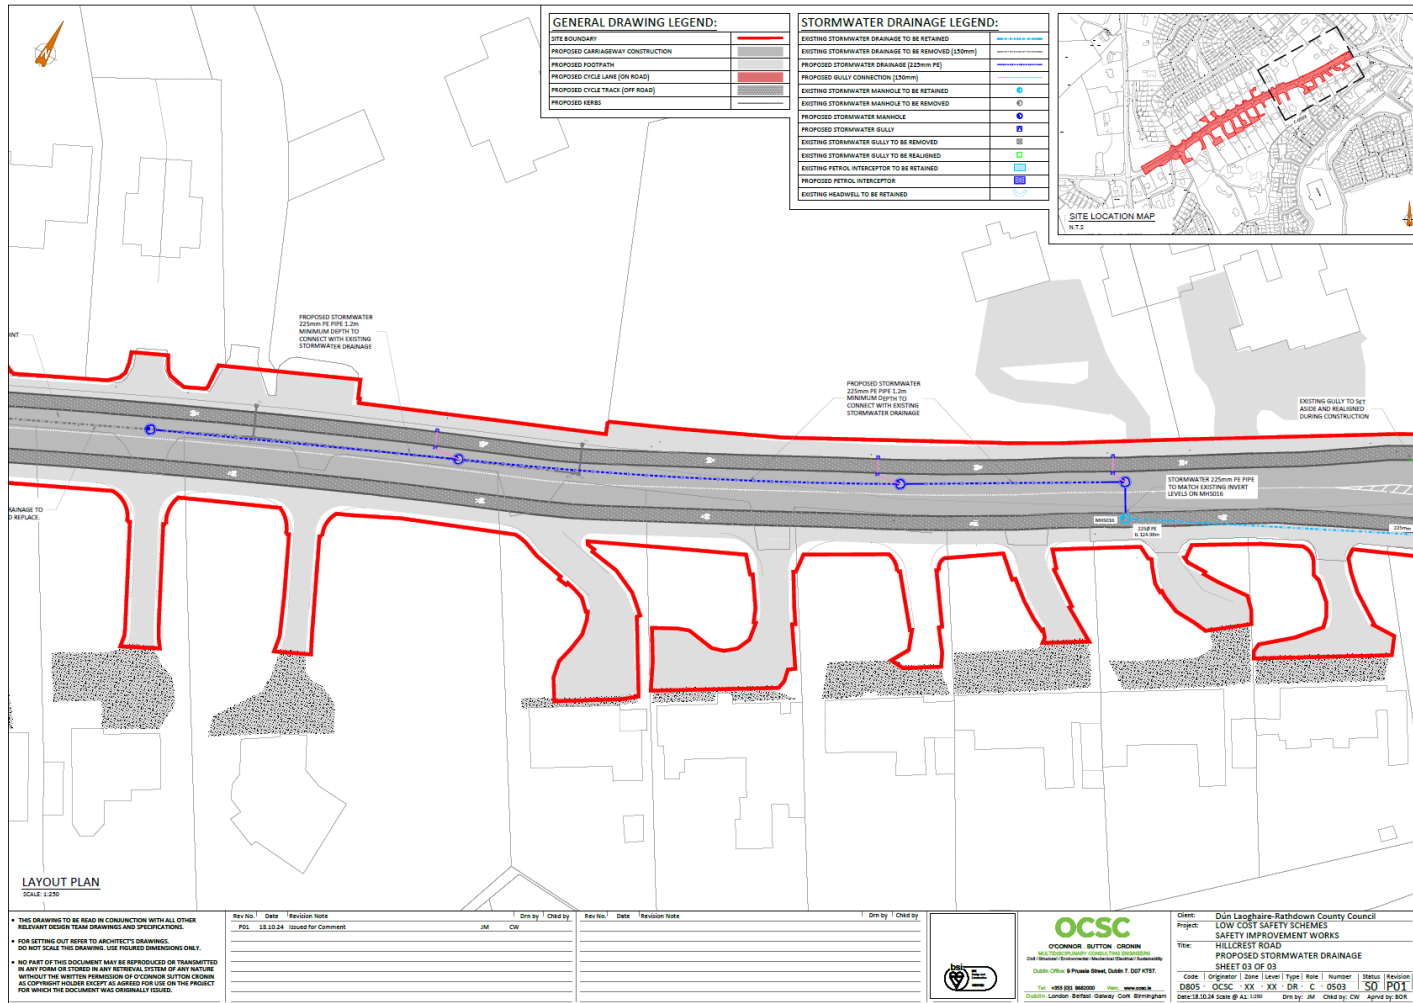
Hillcrest Road Proposed Stormwater Drainage Section C-0503
